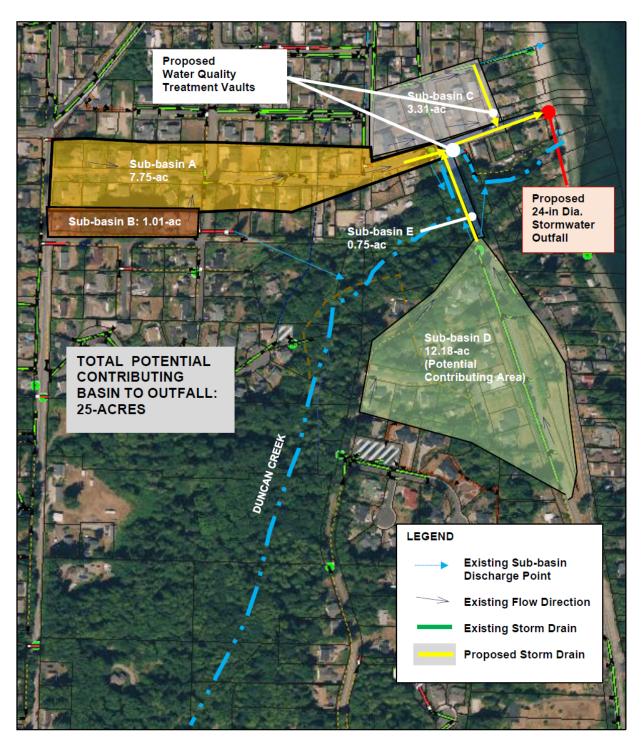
SUB-BINS AND IMPROVEMENTS PLAN
